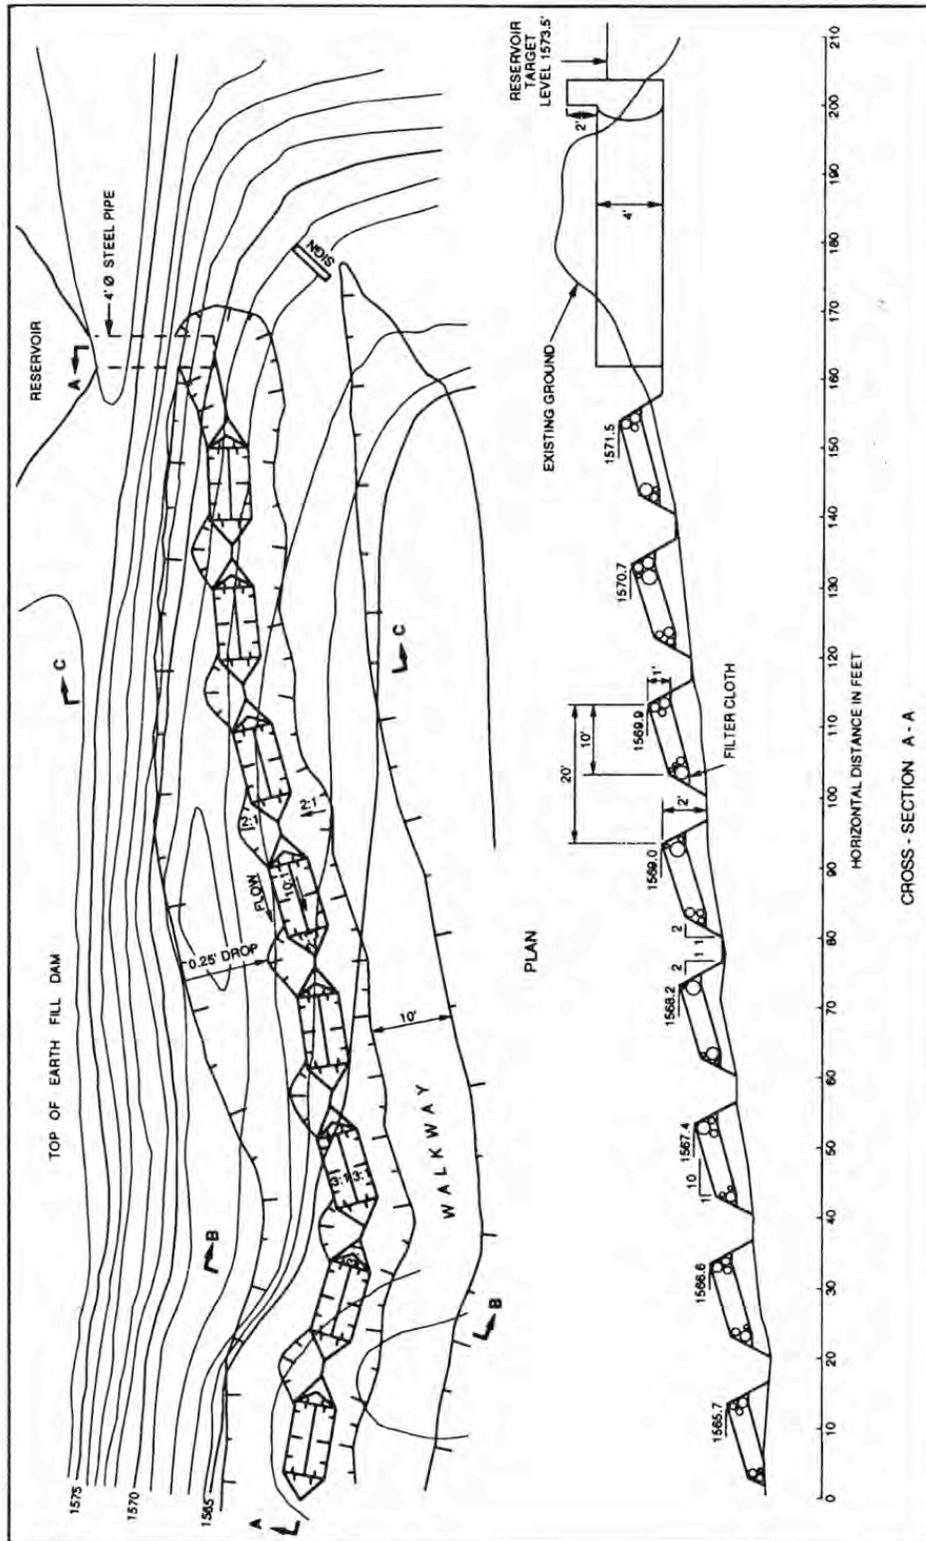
Plan and profile of the Rapid City fishway (drawing: Ewashko Consulting).
